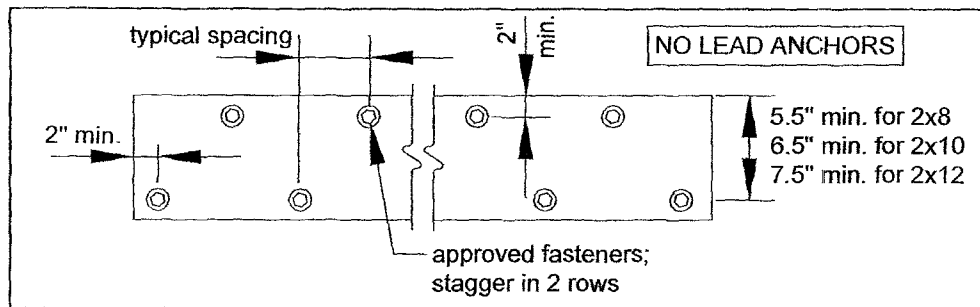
LEDGER BOARD FASTENER SPACING AND CLEARANCES
